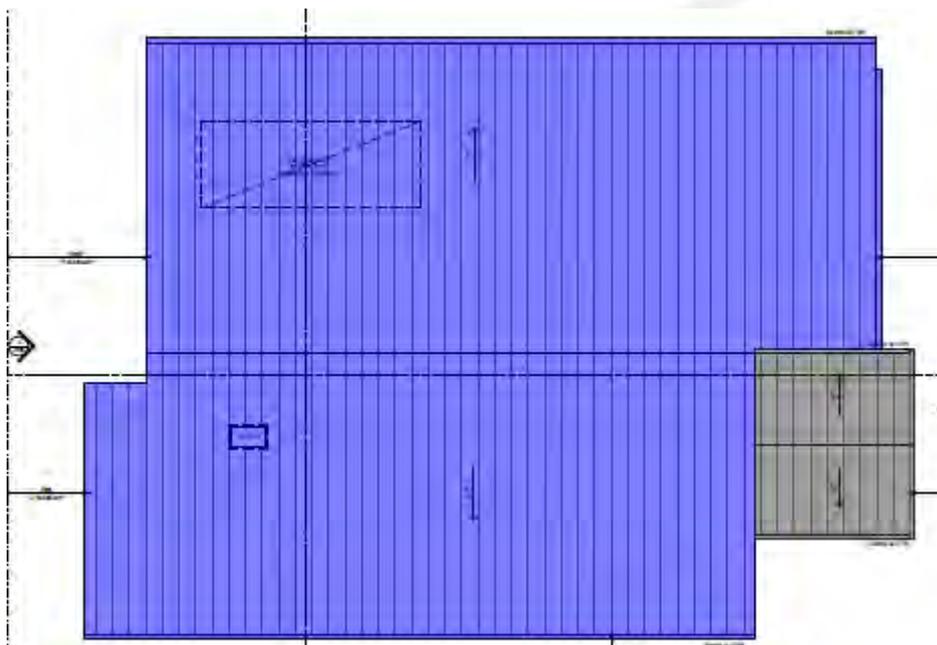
Roof catchment (blue) to RWTs and Untreated Roof (Grey)
